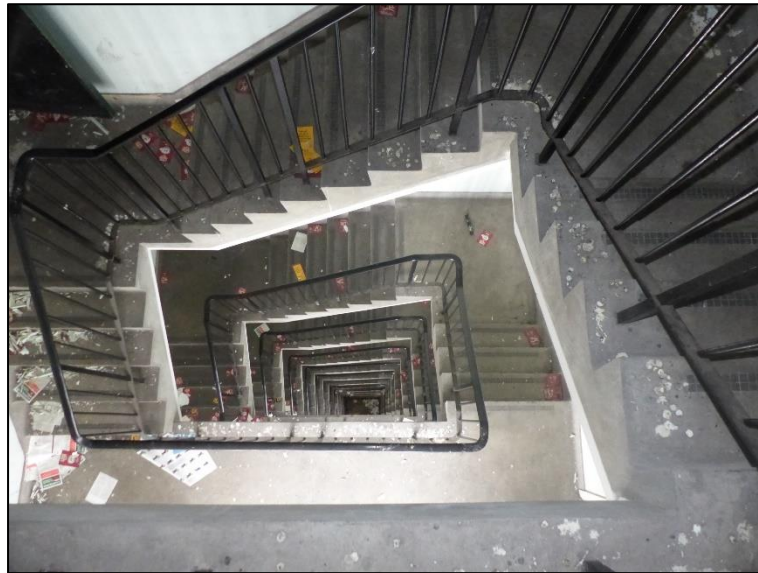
The south staircase, looking down and north from the top floor P13302 18
